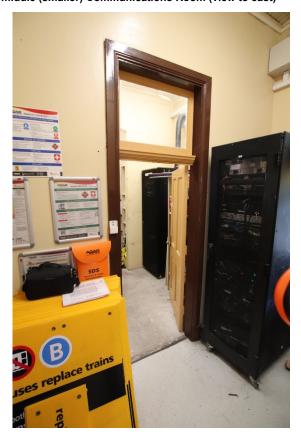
View from the door inside the larger Communications and Storage Room (view to north east)
